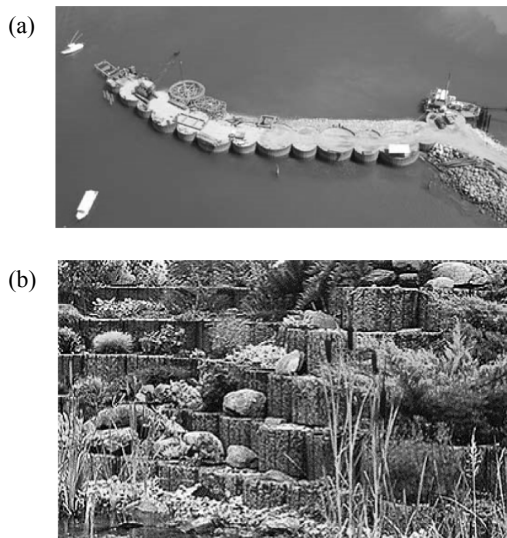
Examples of shells with infill: (a) breakwater in Quepos, Costa Rica¹, (b) retaining wall².
